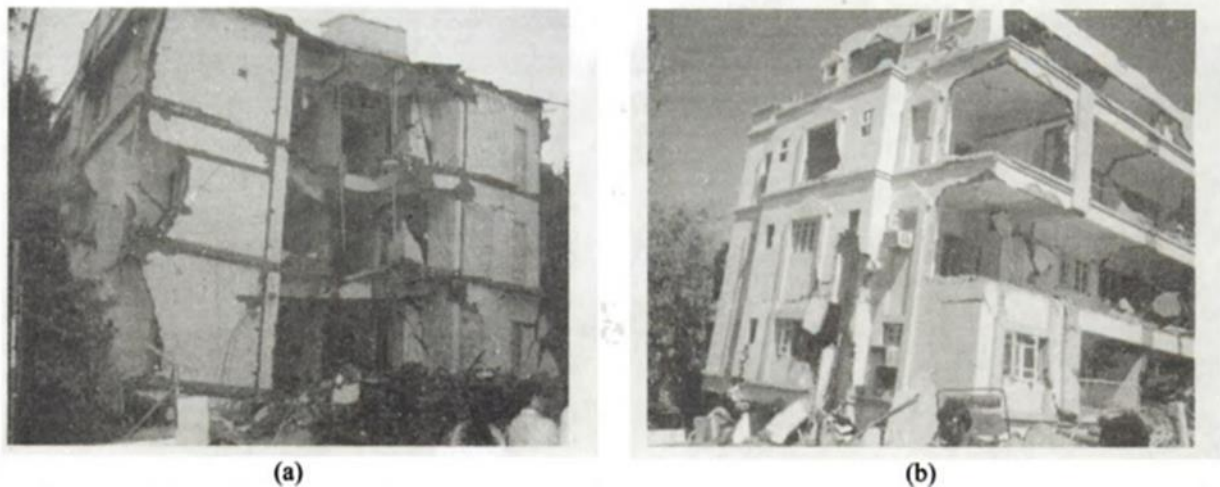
2 Failure of reinforced concrete buildings with floating columns
